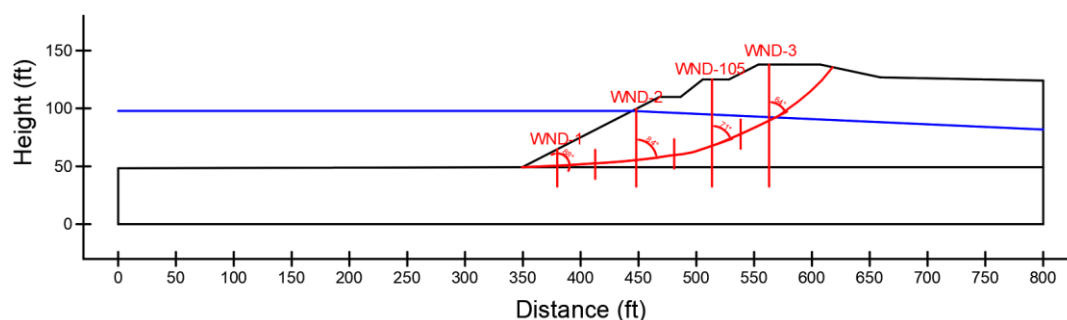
Segmenting (sub-sectioning) of Case history #1: Wachusett Dam North Dike
